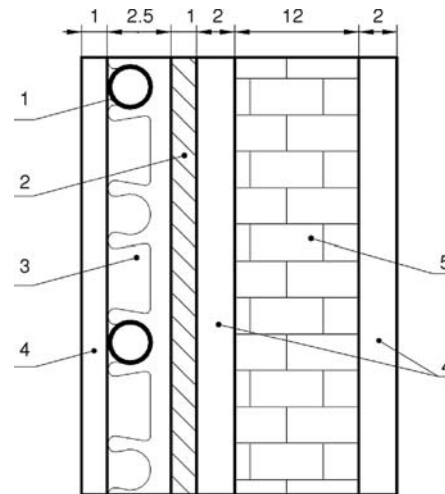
Structure of the inner wall with built-in panel no. 1 (dimensions in cm)
